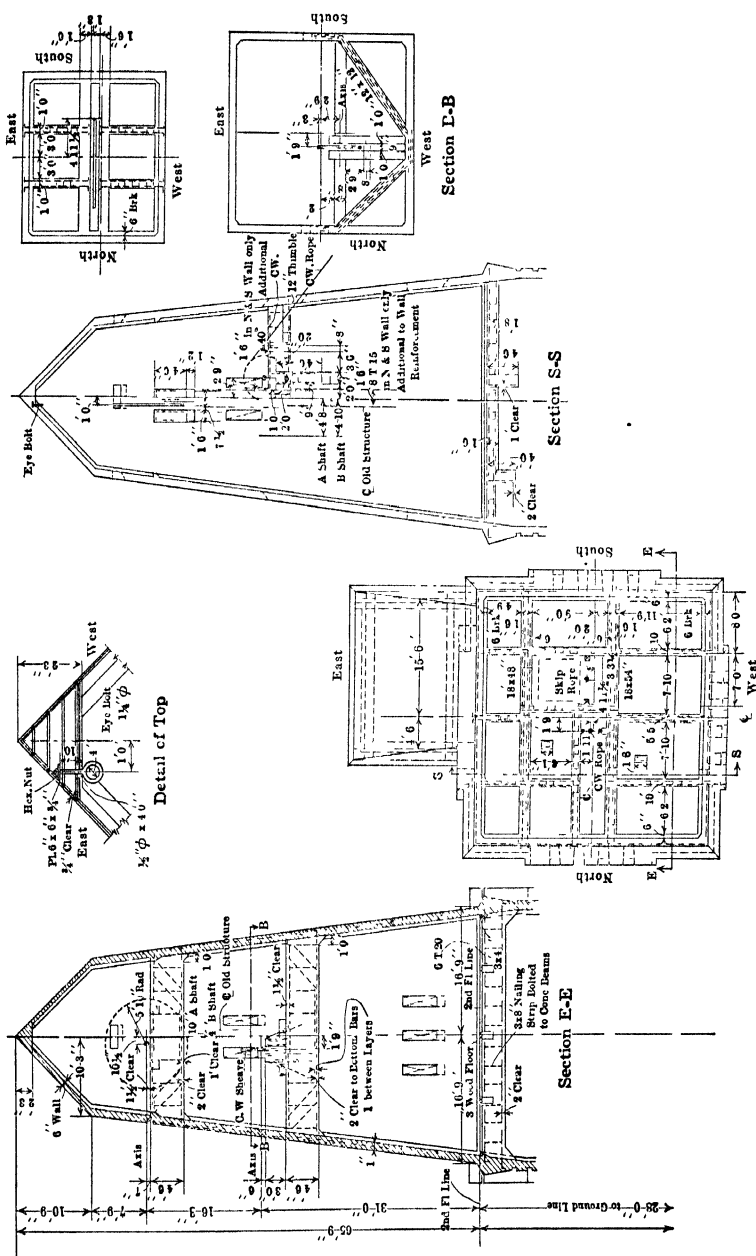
THE COMPLETED A SHAFT HOUSE.
